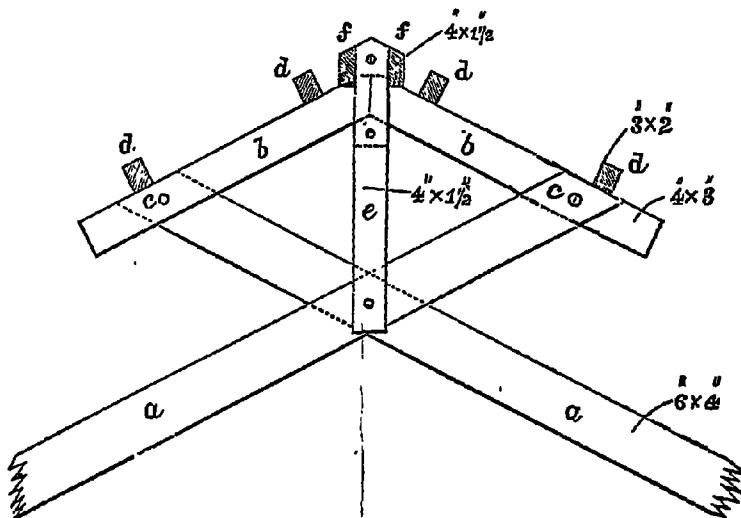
is an elevation showing the arrangement of the roof timbers to provide ventilation along the ridge of a roof. a, a are the principal rafters continued on beyond the ridge, so as to support the small rafters b, b which carry the ventilator; b, b are small rafters which are notched and bolted at c on to the principal rafters; d, d are the battens to which the roof material is fastened; e is a suspending piece (see Fig. 46, page 117), bolted to the principal rafters and to the small rafters; f, f is the ridge piece in two parts, placed one on either side of the suspending pieces. The roof material is not shown. Scale = $\frac{1}{10}$.
